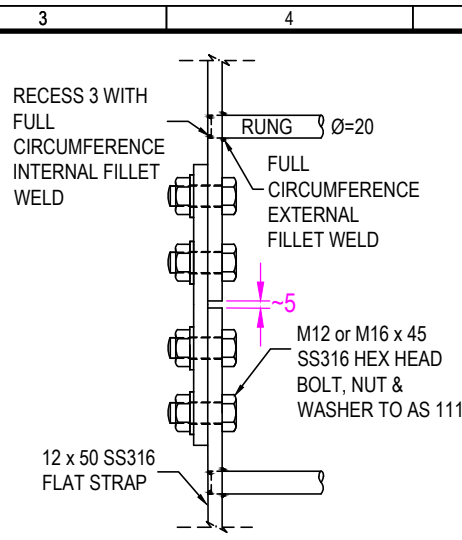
B (SECTION VIEW). SS LADDER JOIN DETAILS
